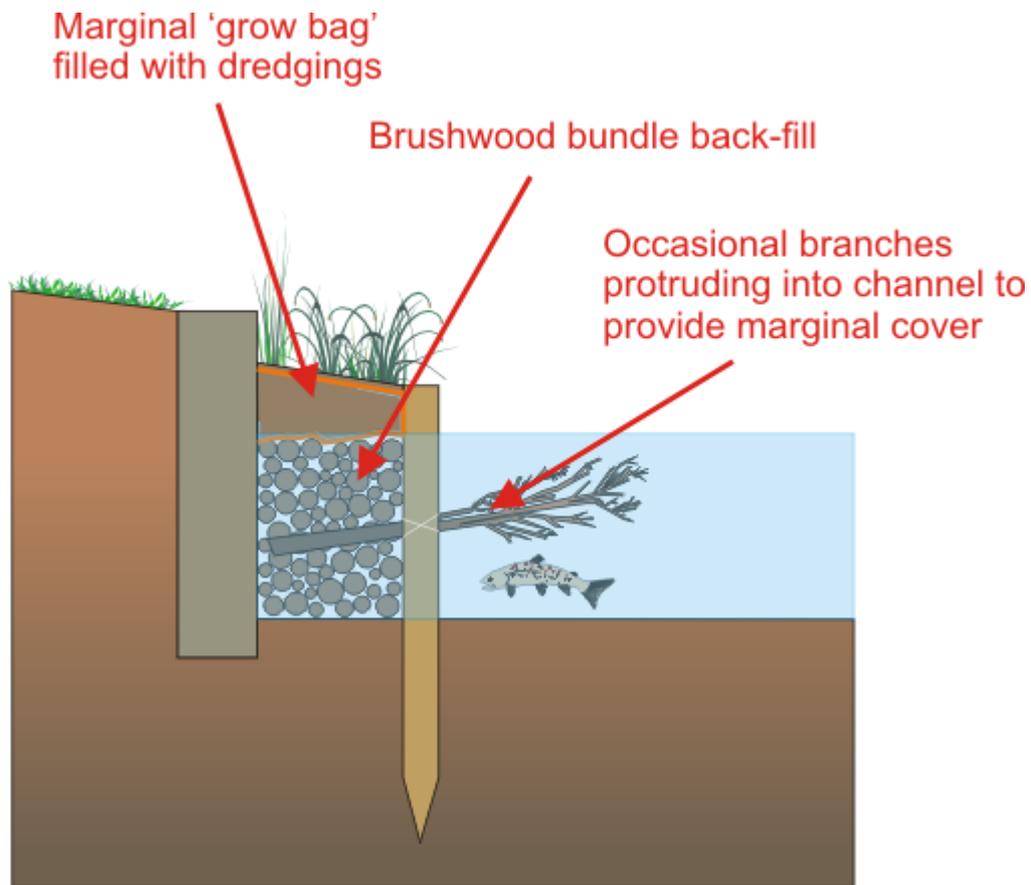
An example cross-section of a marginal revetment with sub-surface cover for trout
